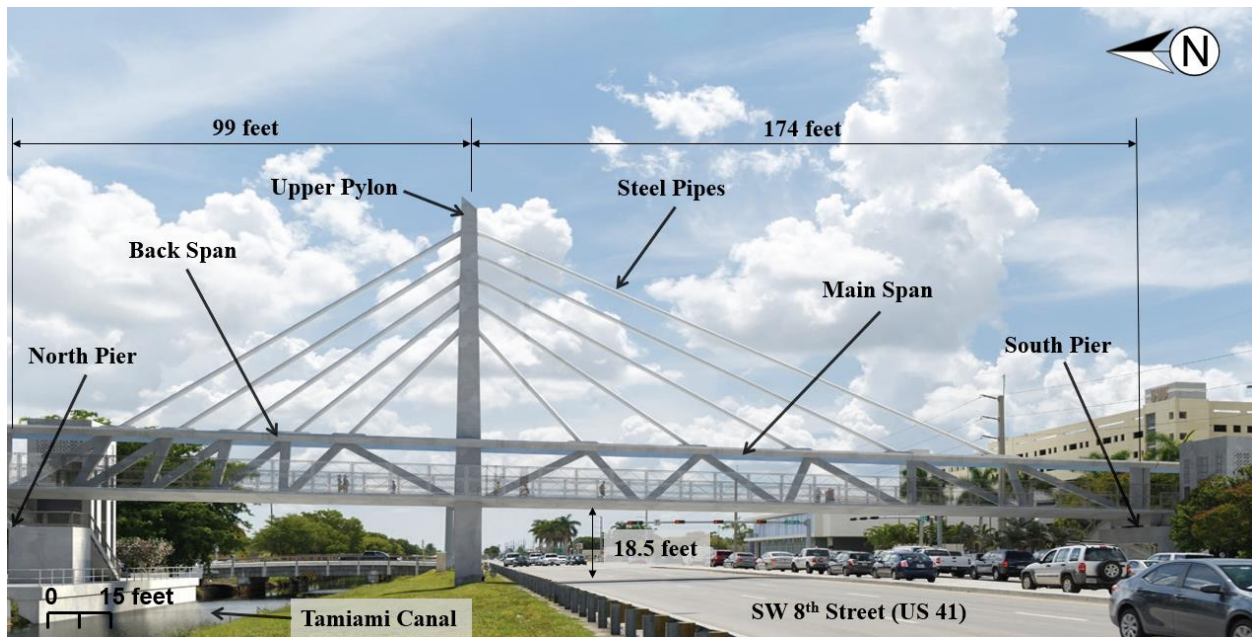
Rendering of what the signature pedestrian bridge would look like when completed looking to the east (Source: FIU modified) Note: Figure 4 does not illustrate 11-foot shift to the north of the entire pedestrian bridge to accommodate a future express bus lane in westbound direction of SW 8th Street (US 41) and construction of the bulkhead wall on the south Tamiami Canal bank that will be discussed later in the Bridge Factors Factual Report.
